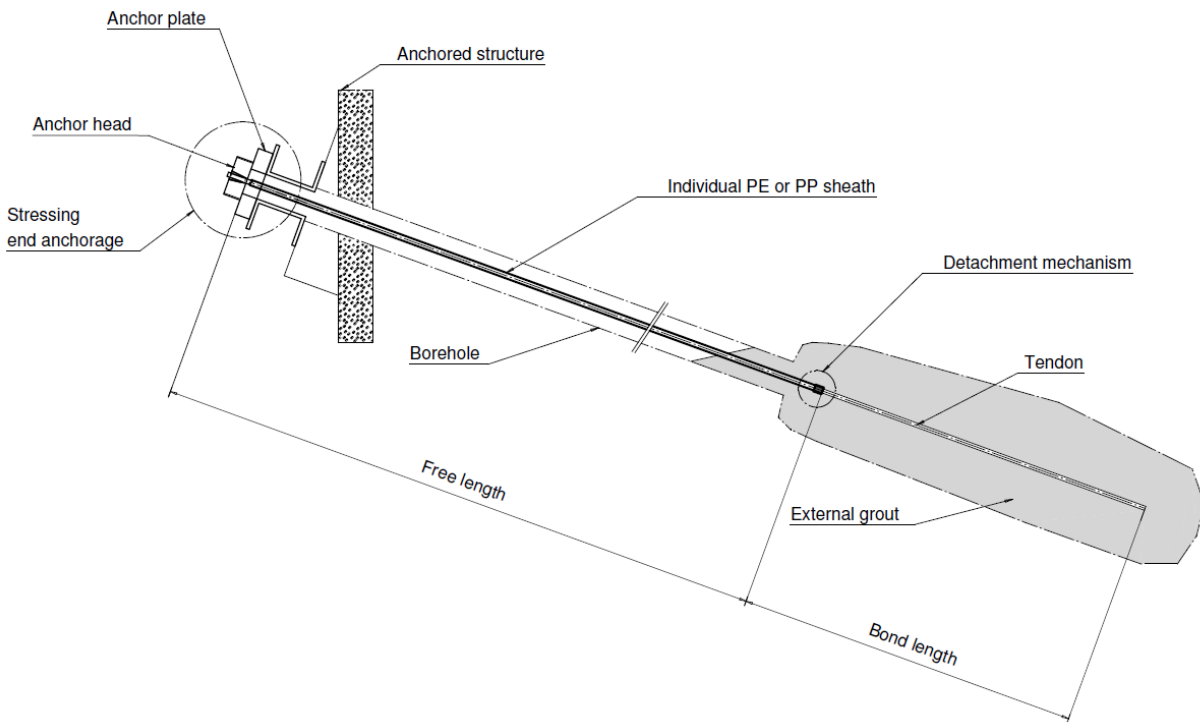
Rock and soil anchor – General schematic and terminology for PLE1 and PLE2
